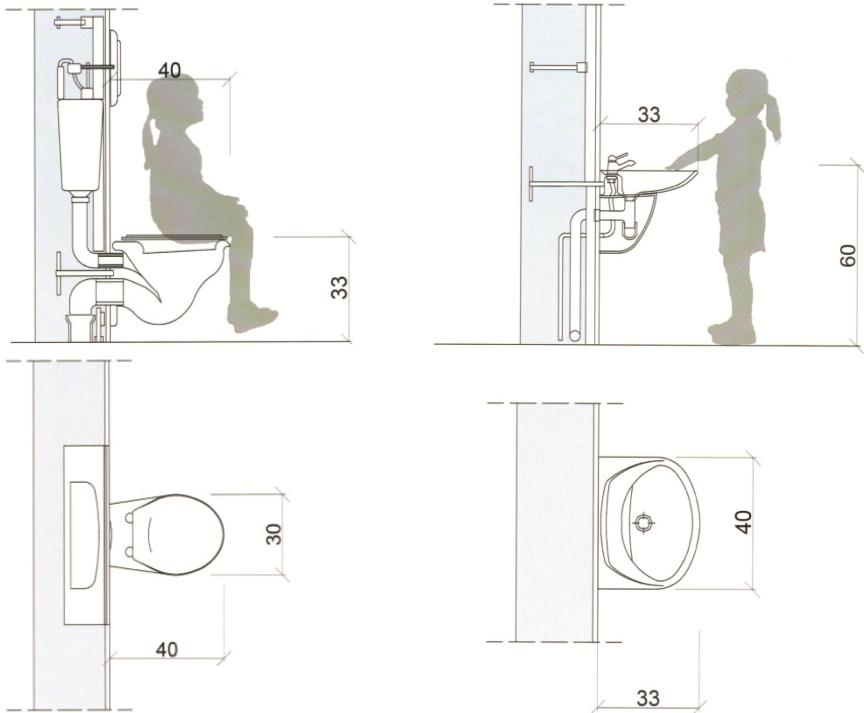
Examples of sanitary facilities adapted to the needs of a preschooler. (Source: own work)
